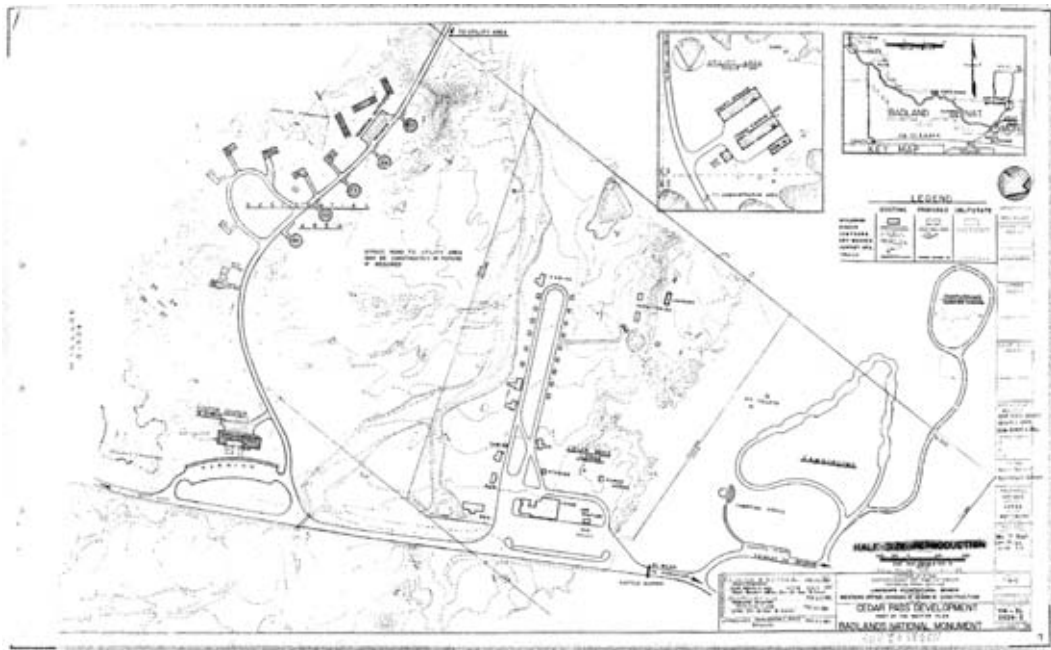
Master plan showing campground area, Mission 66. (DSC-2029-E)
